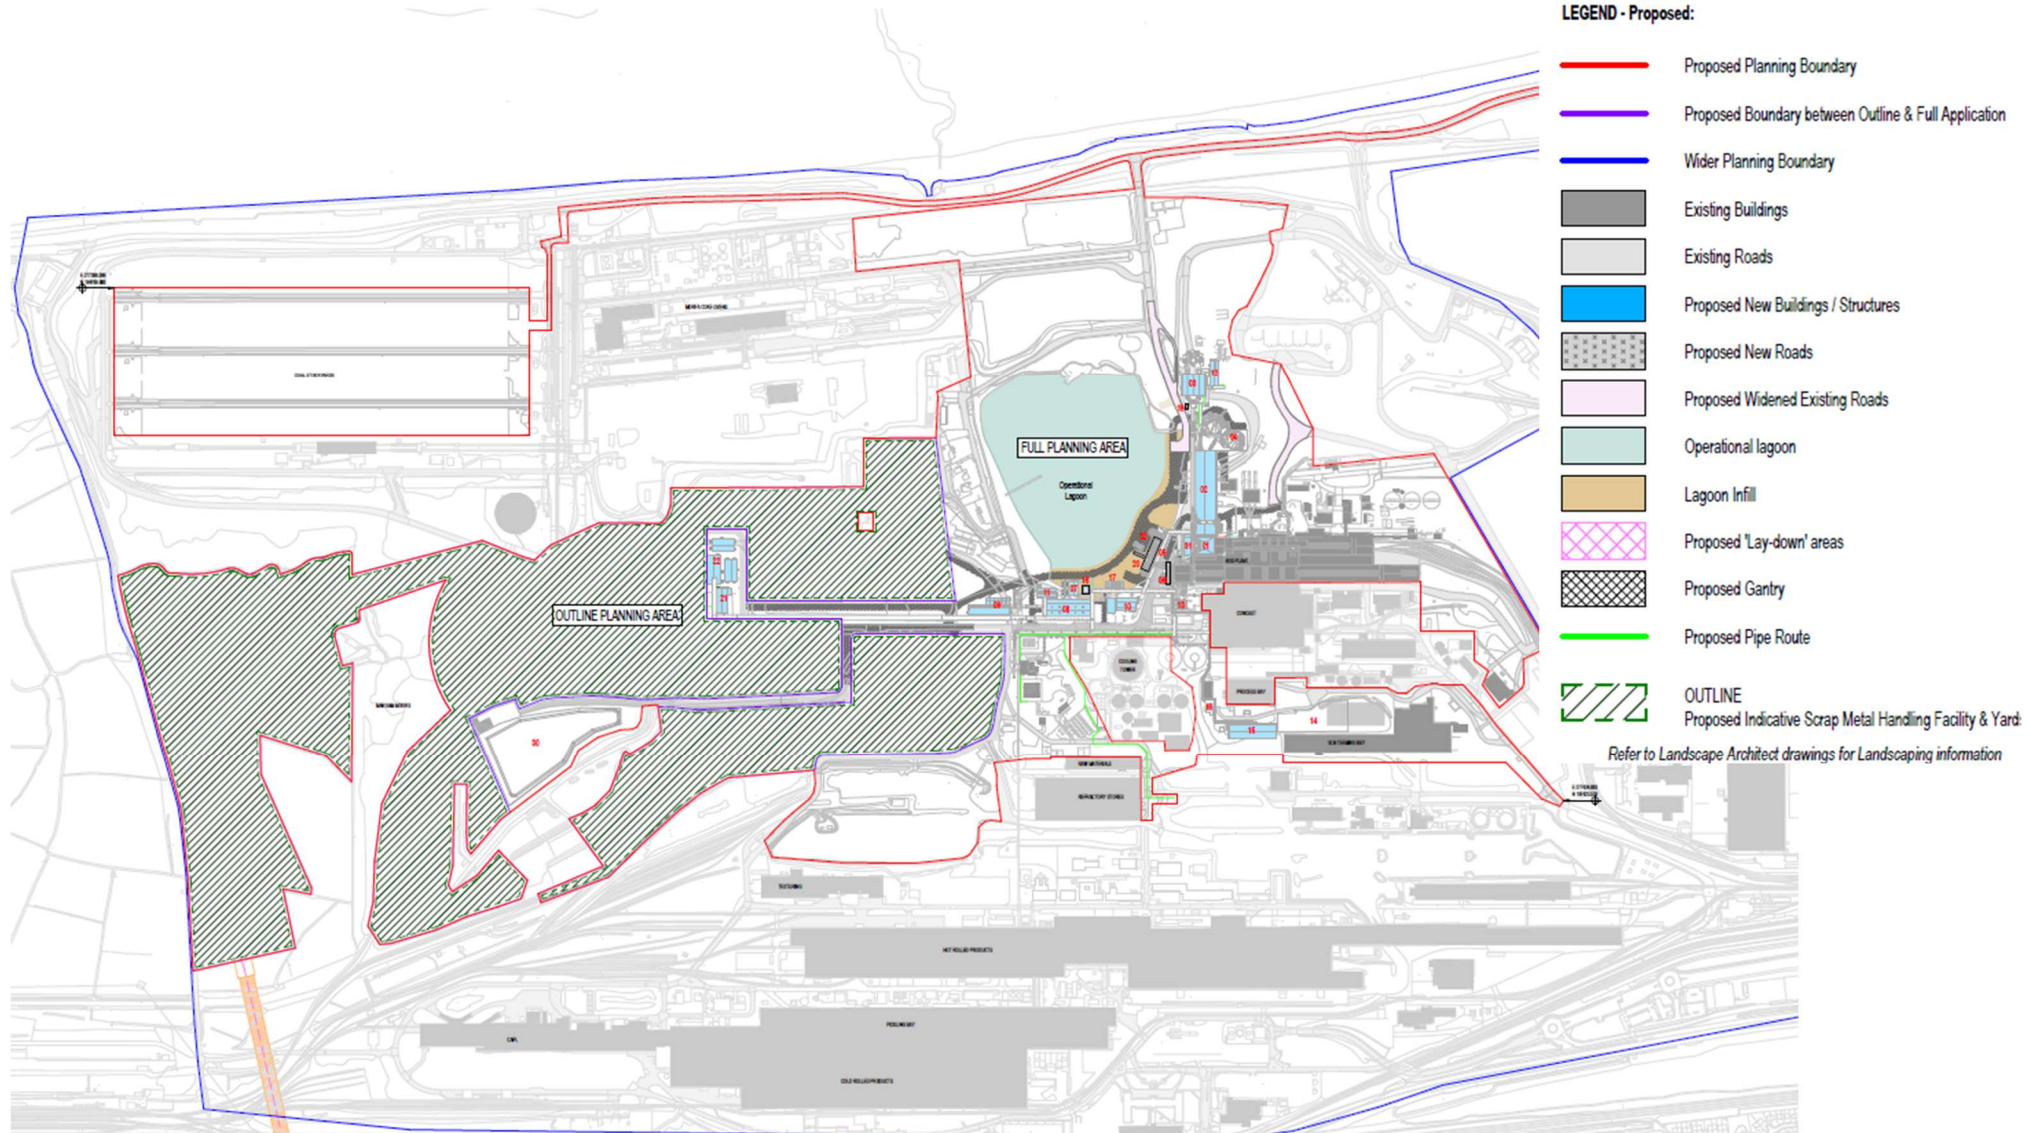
Proposed Development Plan (Source: Lawray Architects)
